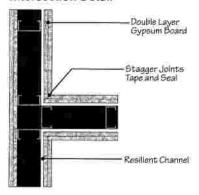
Framing of sound insulating metal stud walls at perimeters, corners and intersections.
